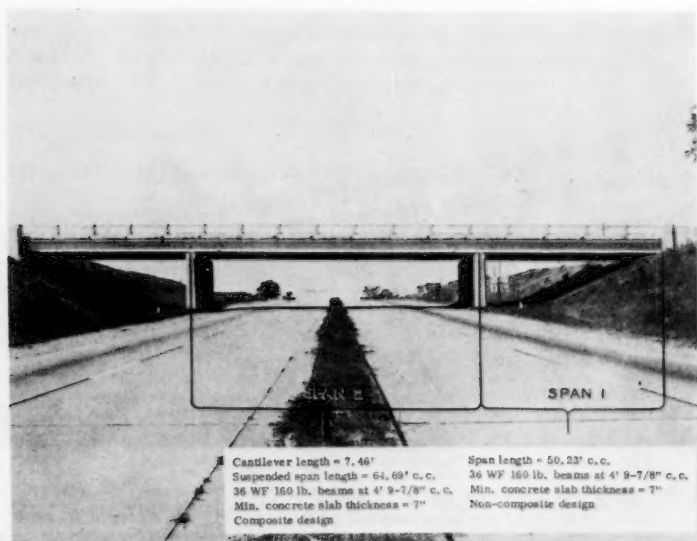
Bridge B3 of 38-1-14. On route US-127 over US-12 north of Jackson. Rolled beam cantilever-type bridge.
